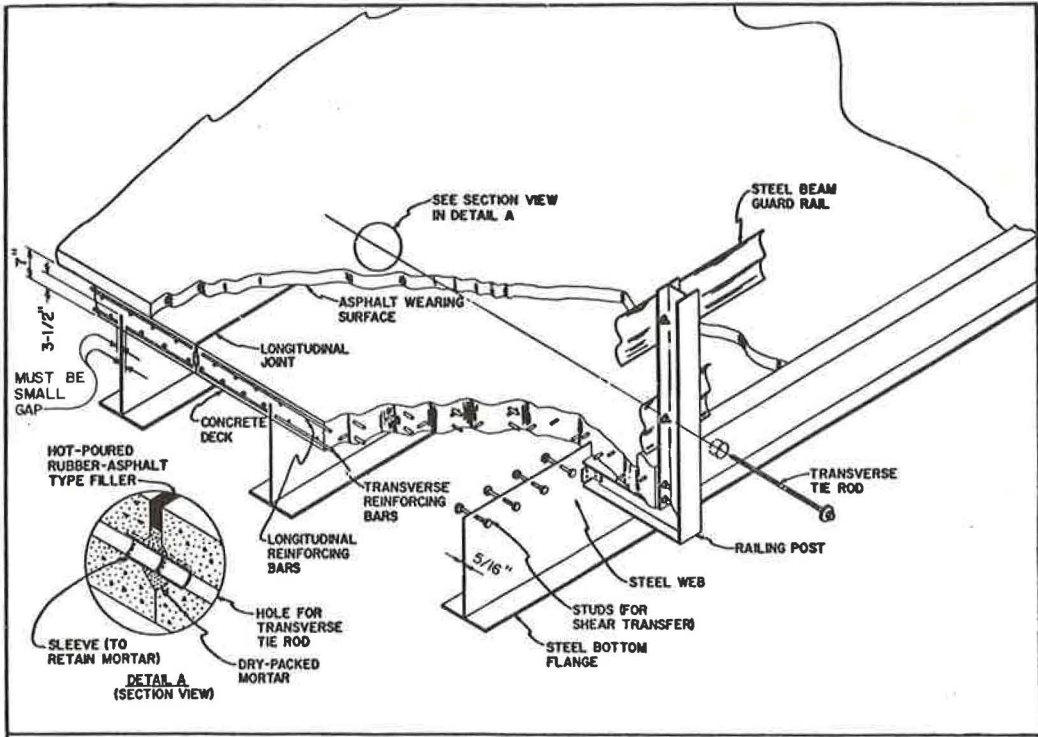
Prefabricated composite highway bridge unit with inverted steel T-beams.
